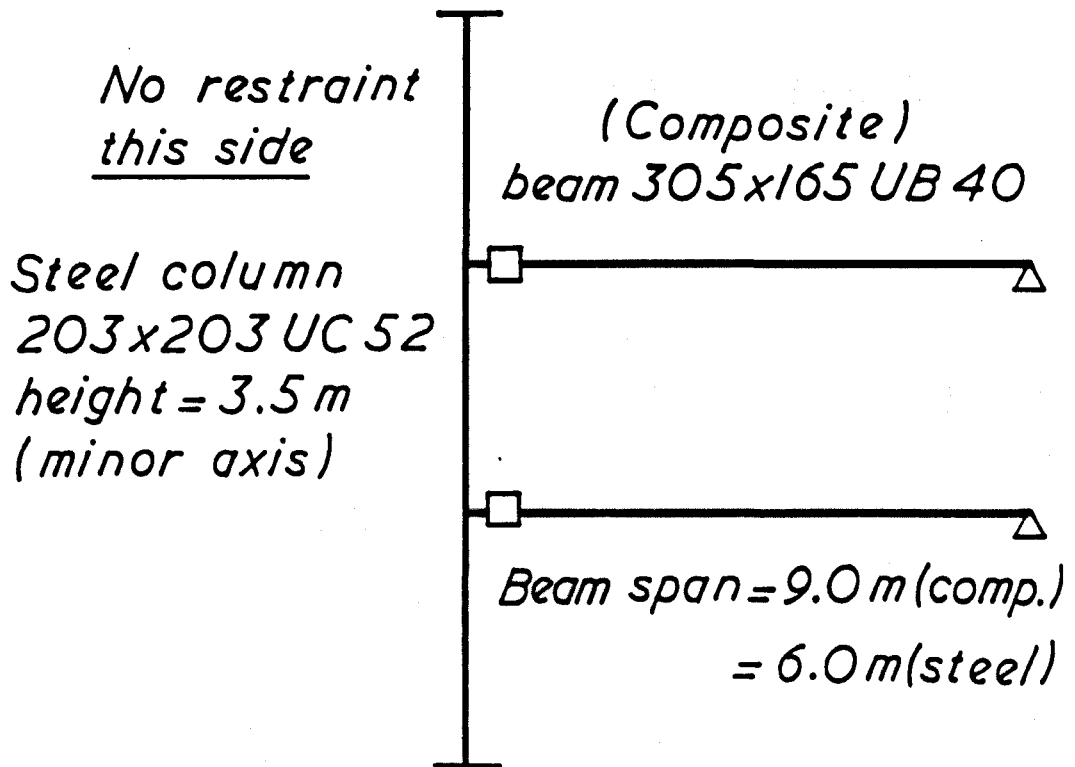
, Assemblage assumed in quantifying effective length of column
